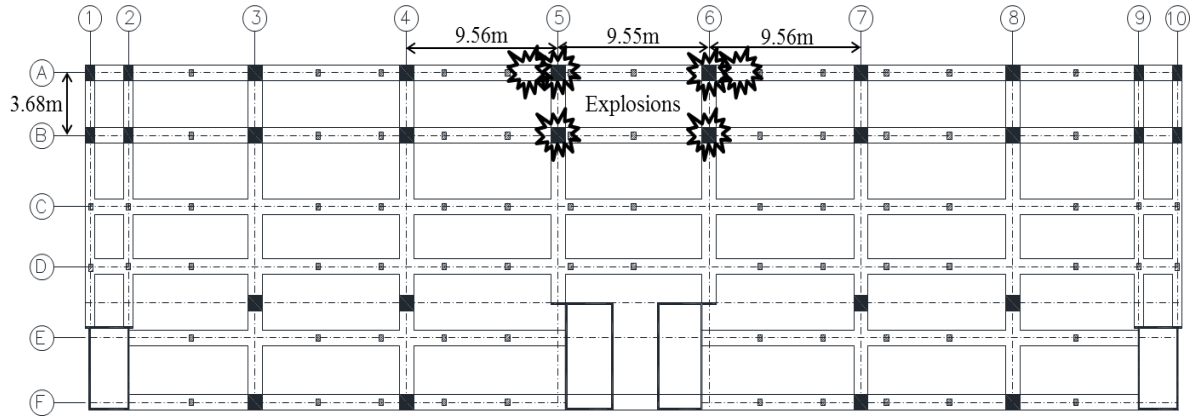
First floor plan of RC Crowne Plaza hotel, Sasani (2011)
